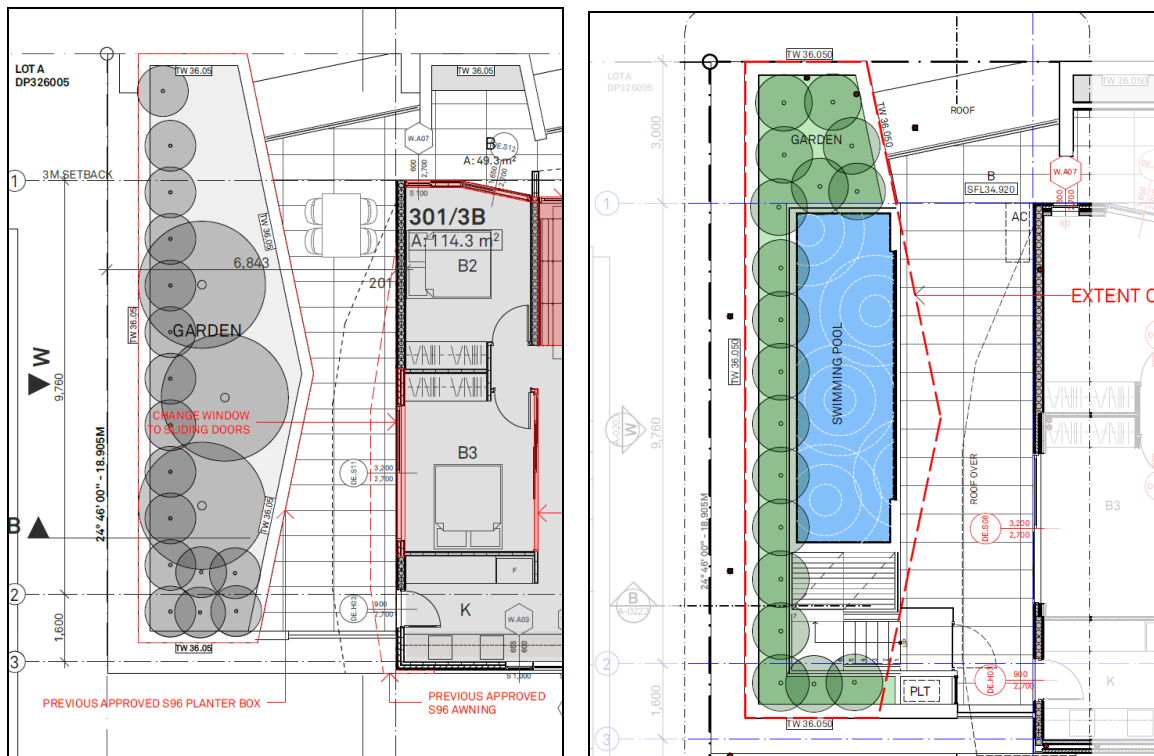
Approved roof terrace (left) and proposed roof terrace with pool (right)
